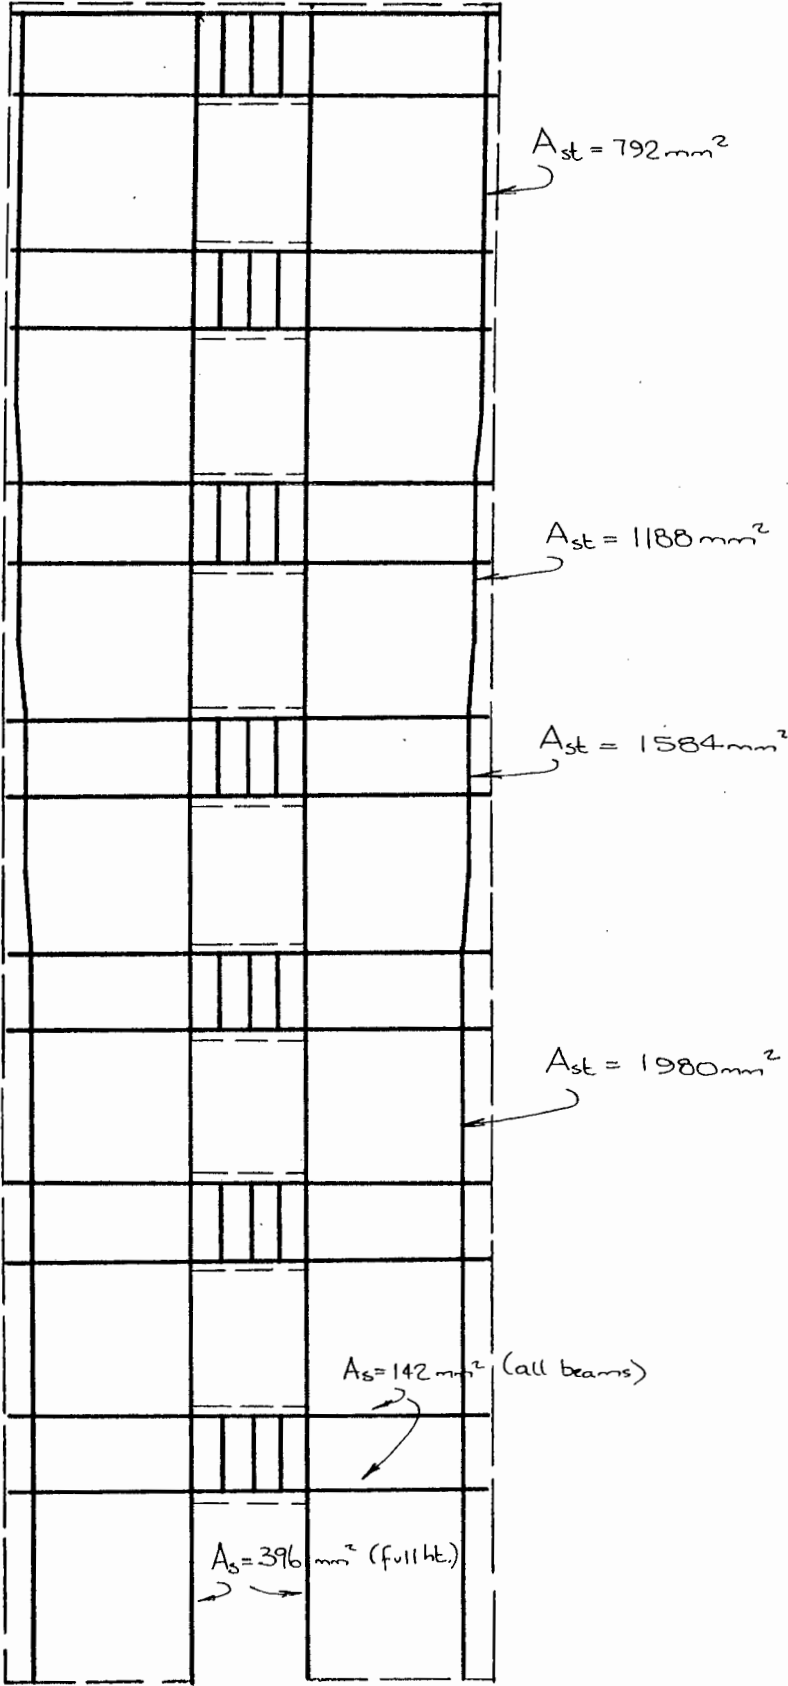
7-Storey Wall: Reinforcement Layout using Non-Linear Finite Element Analysis
